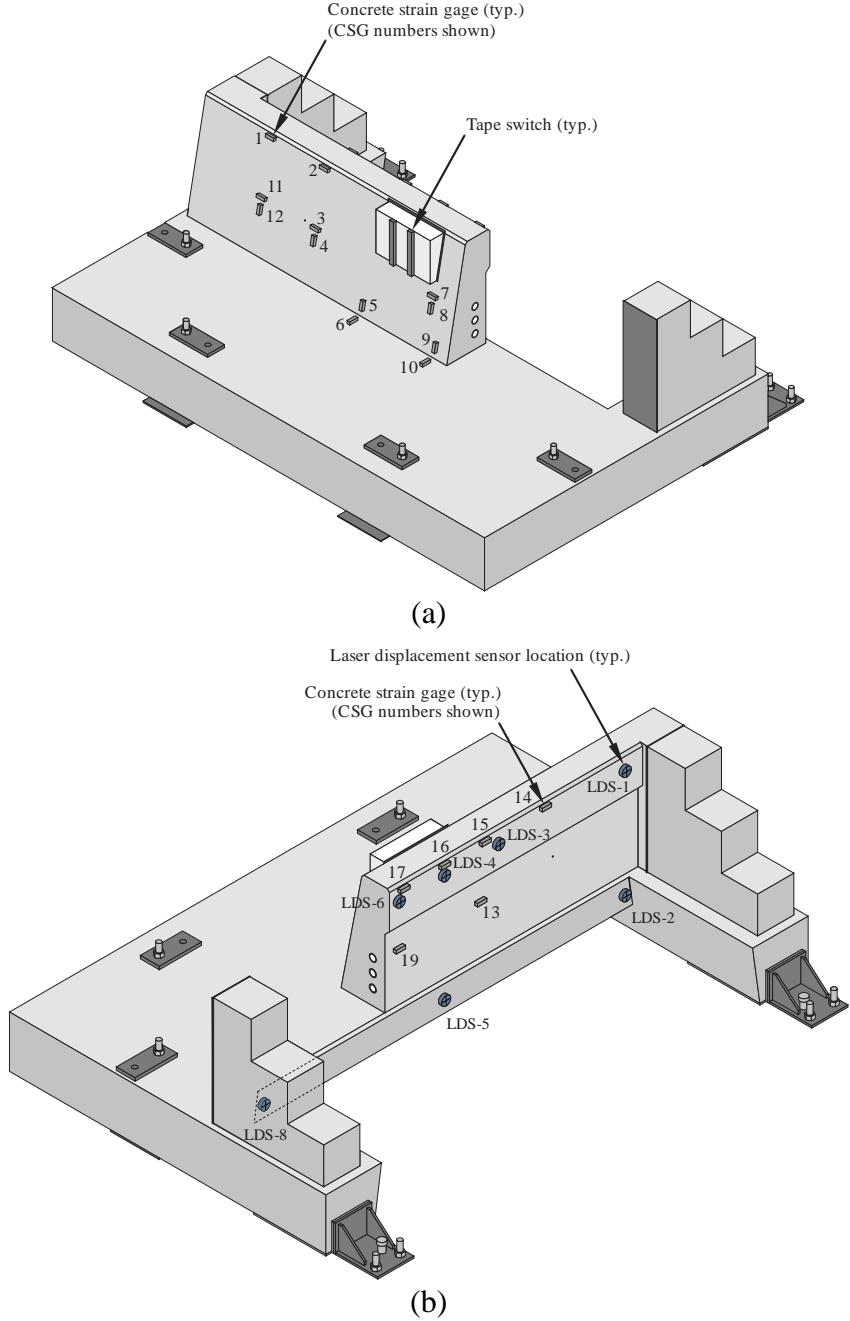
External EOR instrumentation: (a) Front concrete strain gage and tape switch sensor locations; (b) Back concrete strain gage and laser displacement sensor locations
